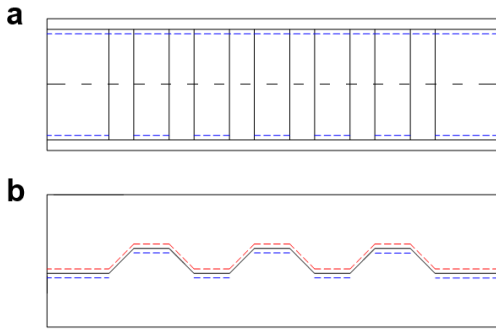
Welding locations highlighted in blue and red on (a) profile of and (b) section through test beam.
